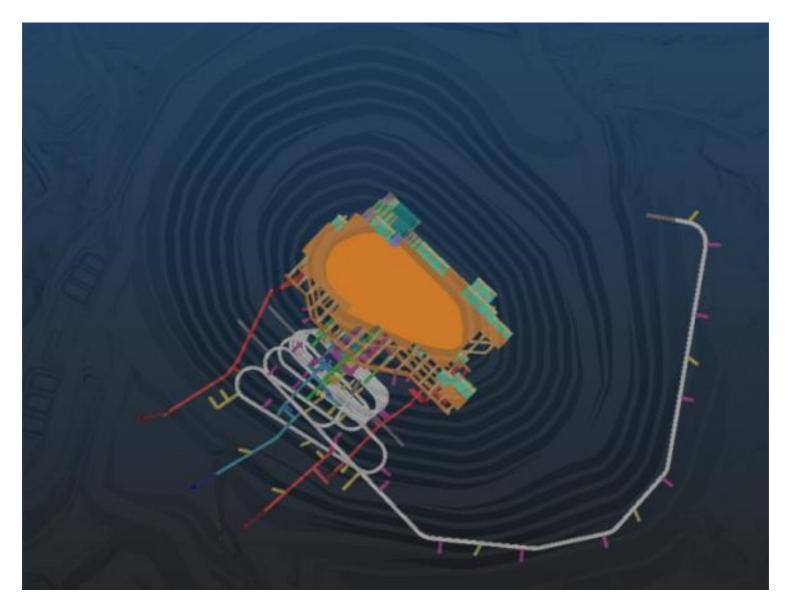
Access decline with final Stage 6 pit design - Plan View
